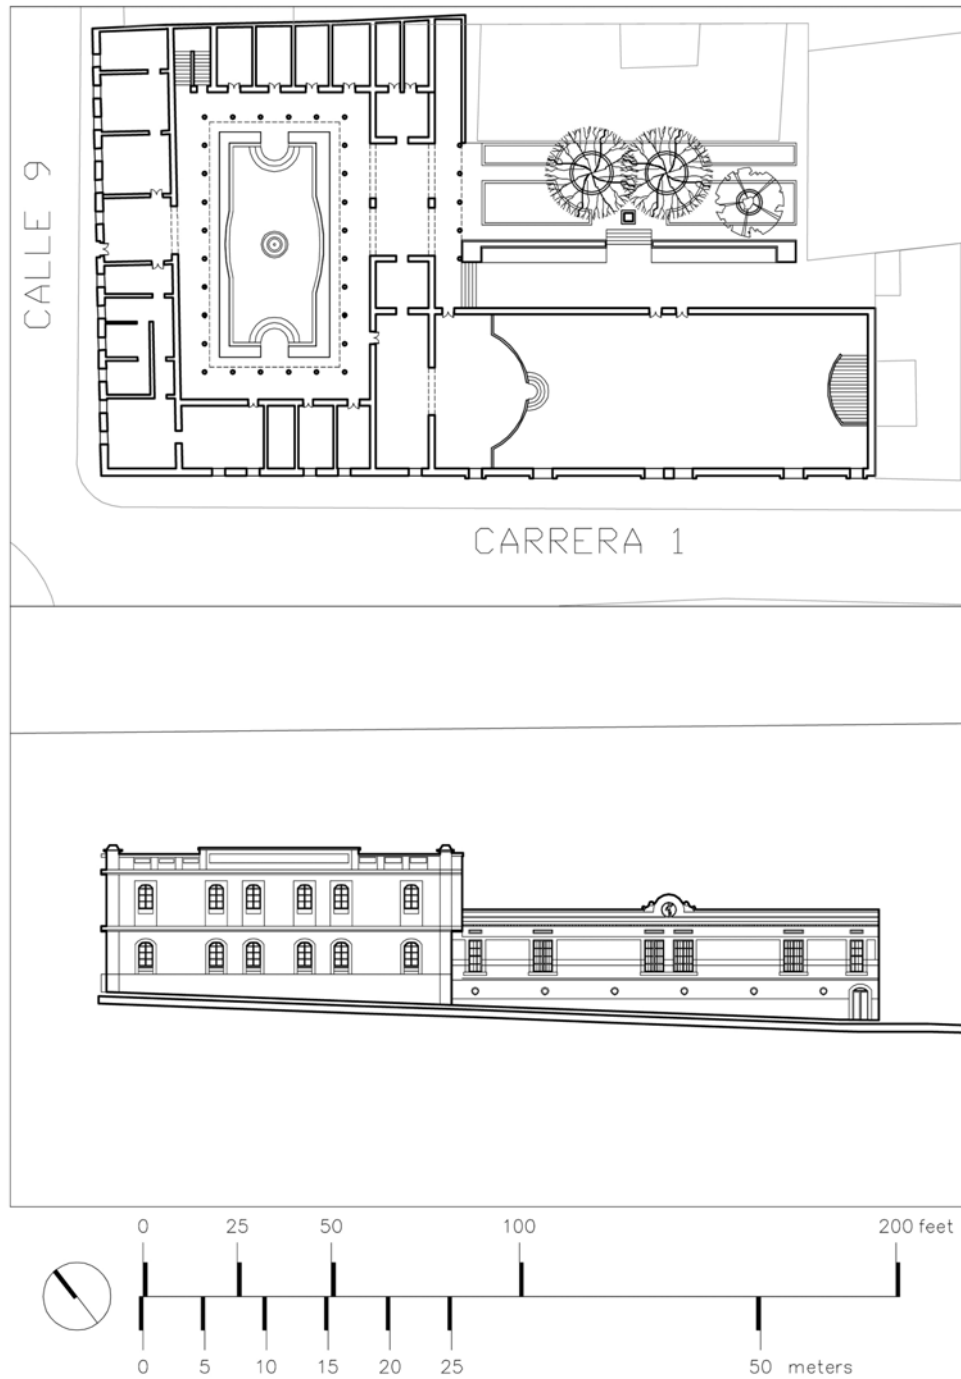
Old conservatory and Alberto Castilla Music Hall: plan and elevation from Cra. 1.
